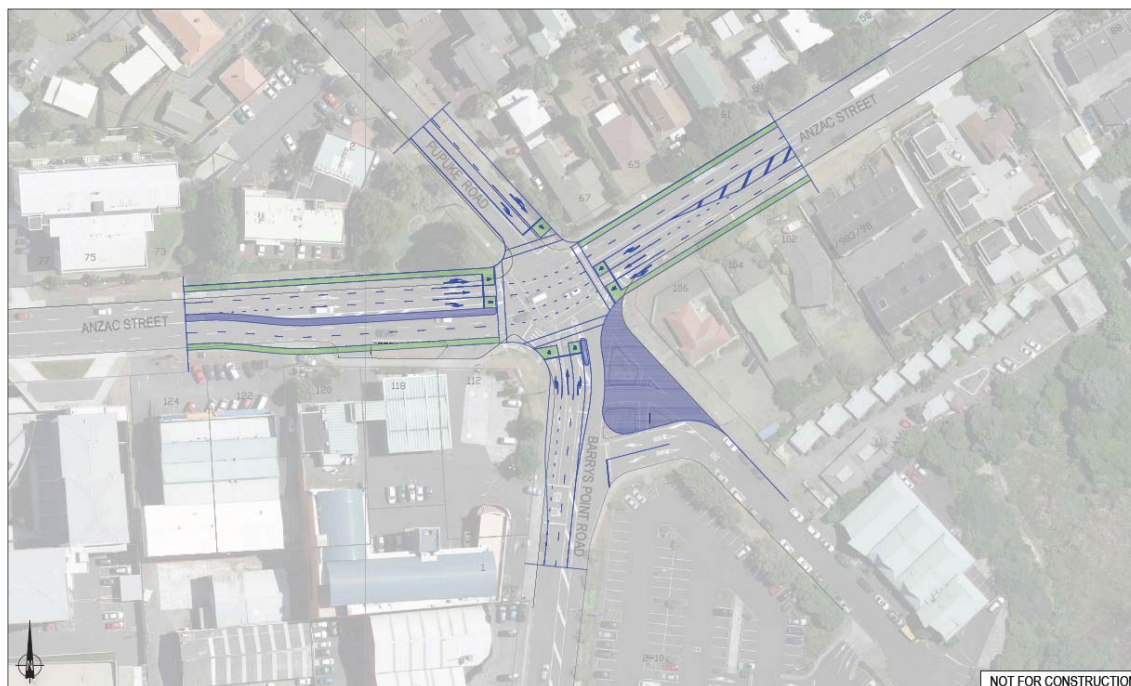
Barry's Point Road/Anzac Street Intersection: Long Term Option (Indicative)
